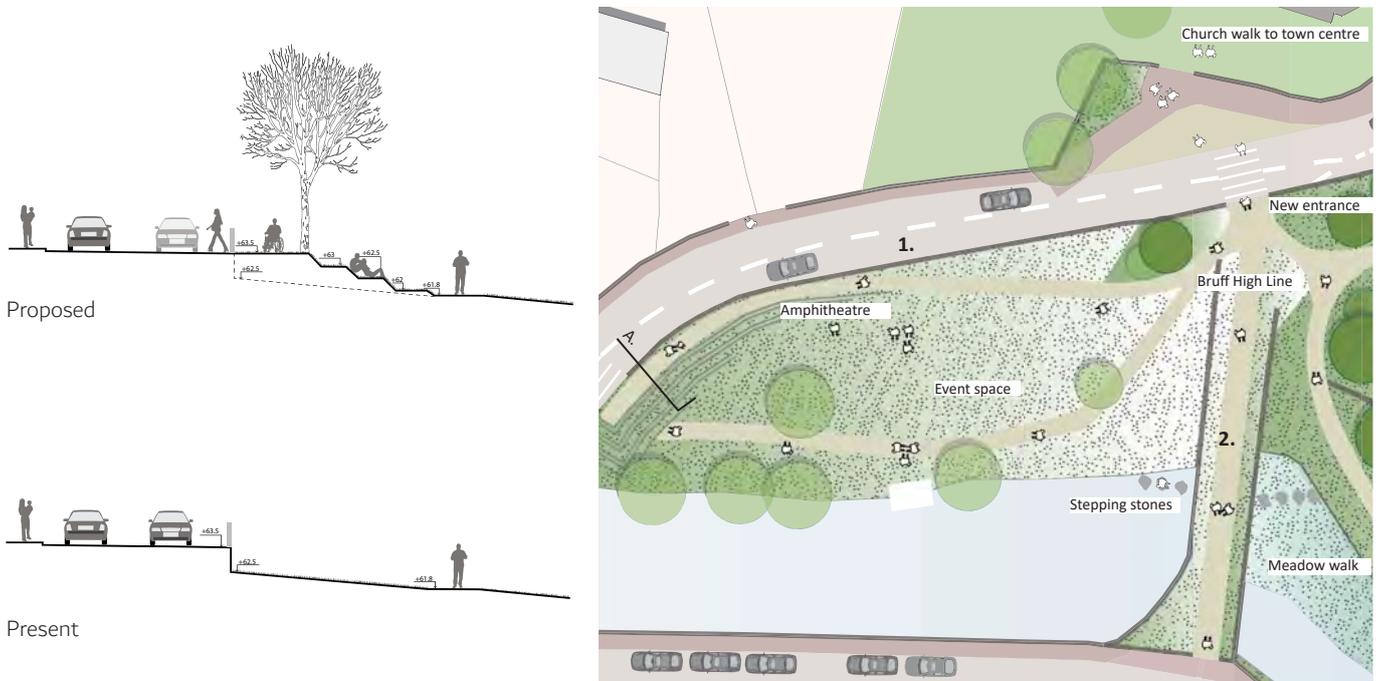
Proposed plan detail for Morning Star Park with sections
